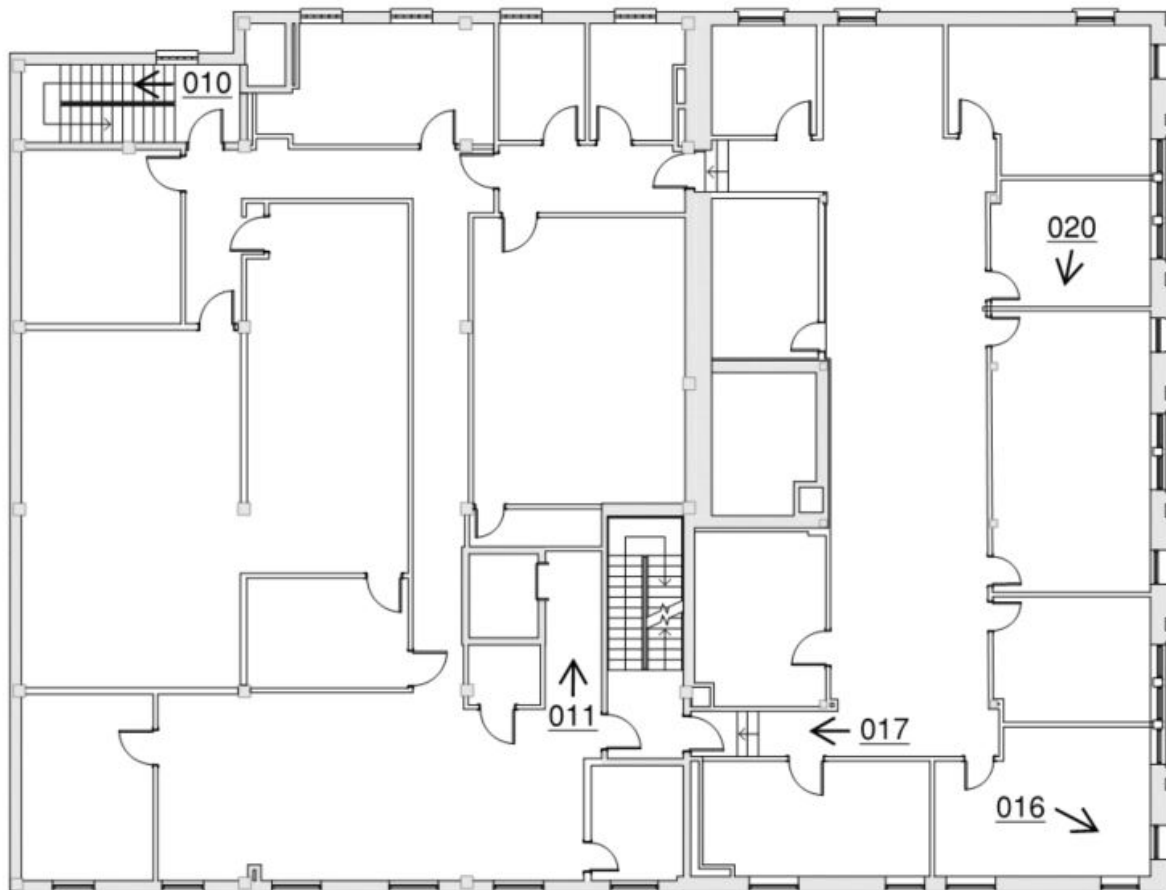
Second Floor Photographic Key Plan. Alley Poyner Macchietto Architecture, Omaha, Nebraska, 2021
